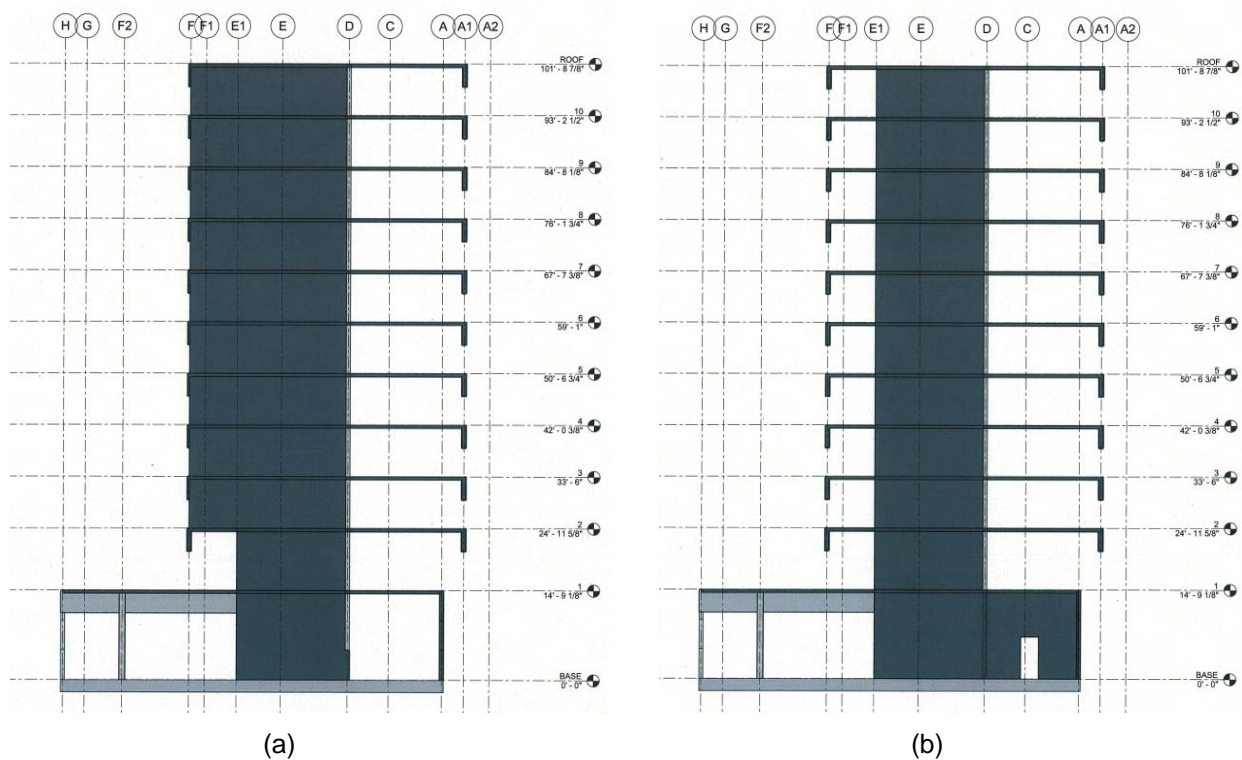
Comparison of typical transverse wall elevations: (a) Chilean configuration; and (b) U.S. configuration.
